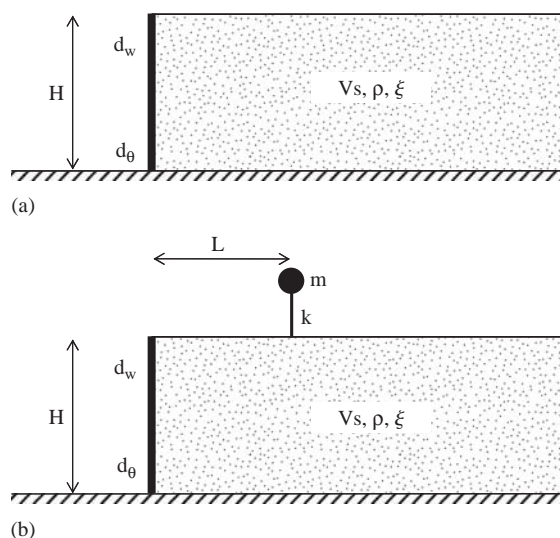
The retaining systems examined in this study: (a) a wall retaining a single soil layer, (b) a wall retaining a soil layer on which a simple structure is founded at distance L .
